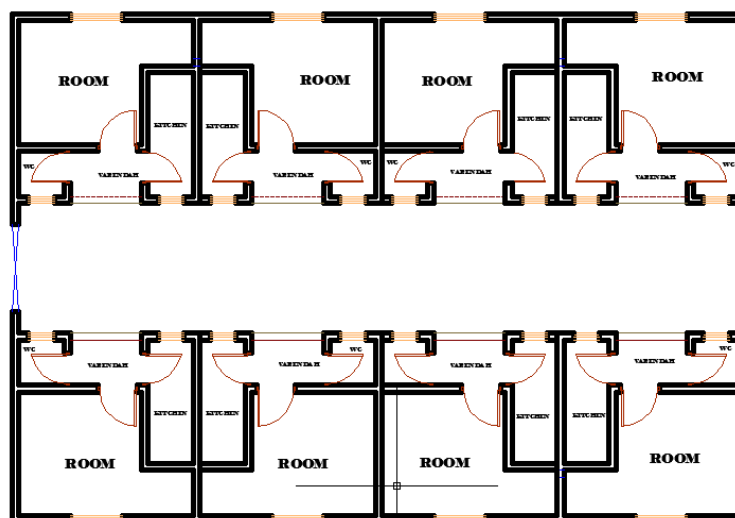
Typical Floor Plan of Grace Villa Hostel in Unwana
